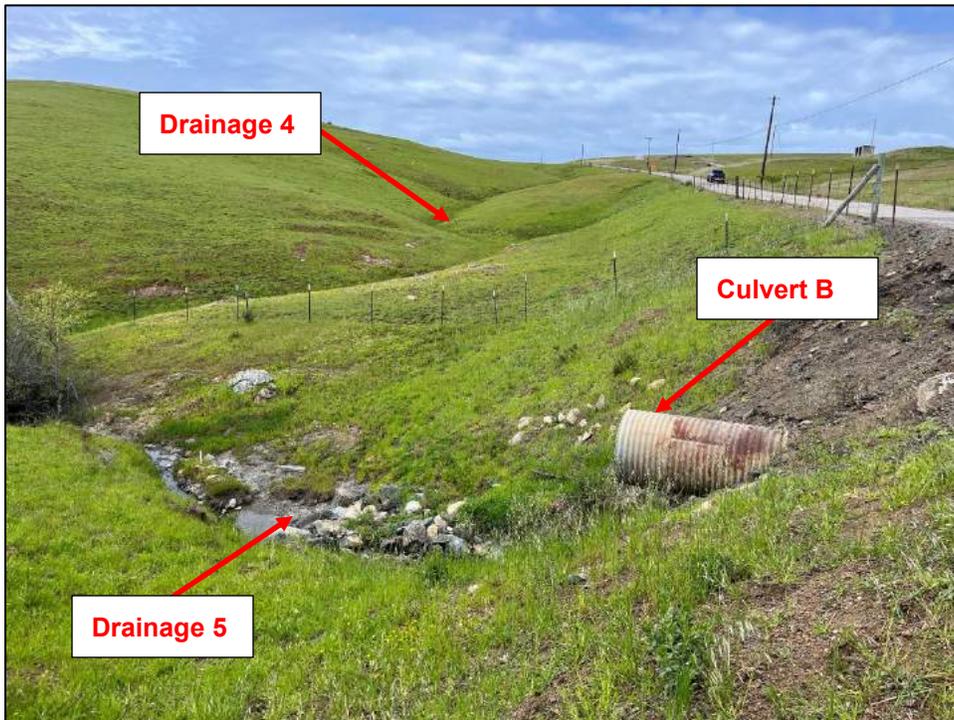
View west of Drainages 4 and 5 immediately downstream of Culvert B. Photo taken April 6, 2023.
